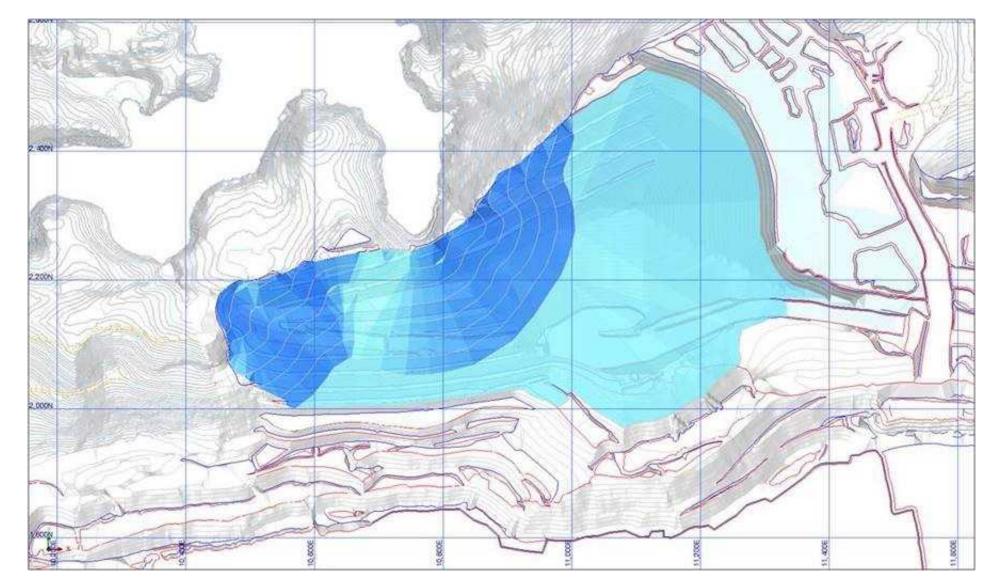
Approved Backfilled Mullet Pit Landform Design (subject to revision upon future DMIRS approval)
